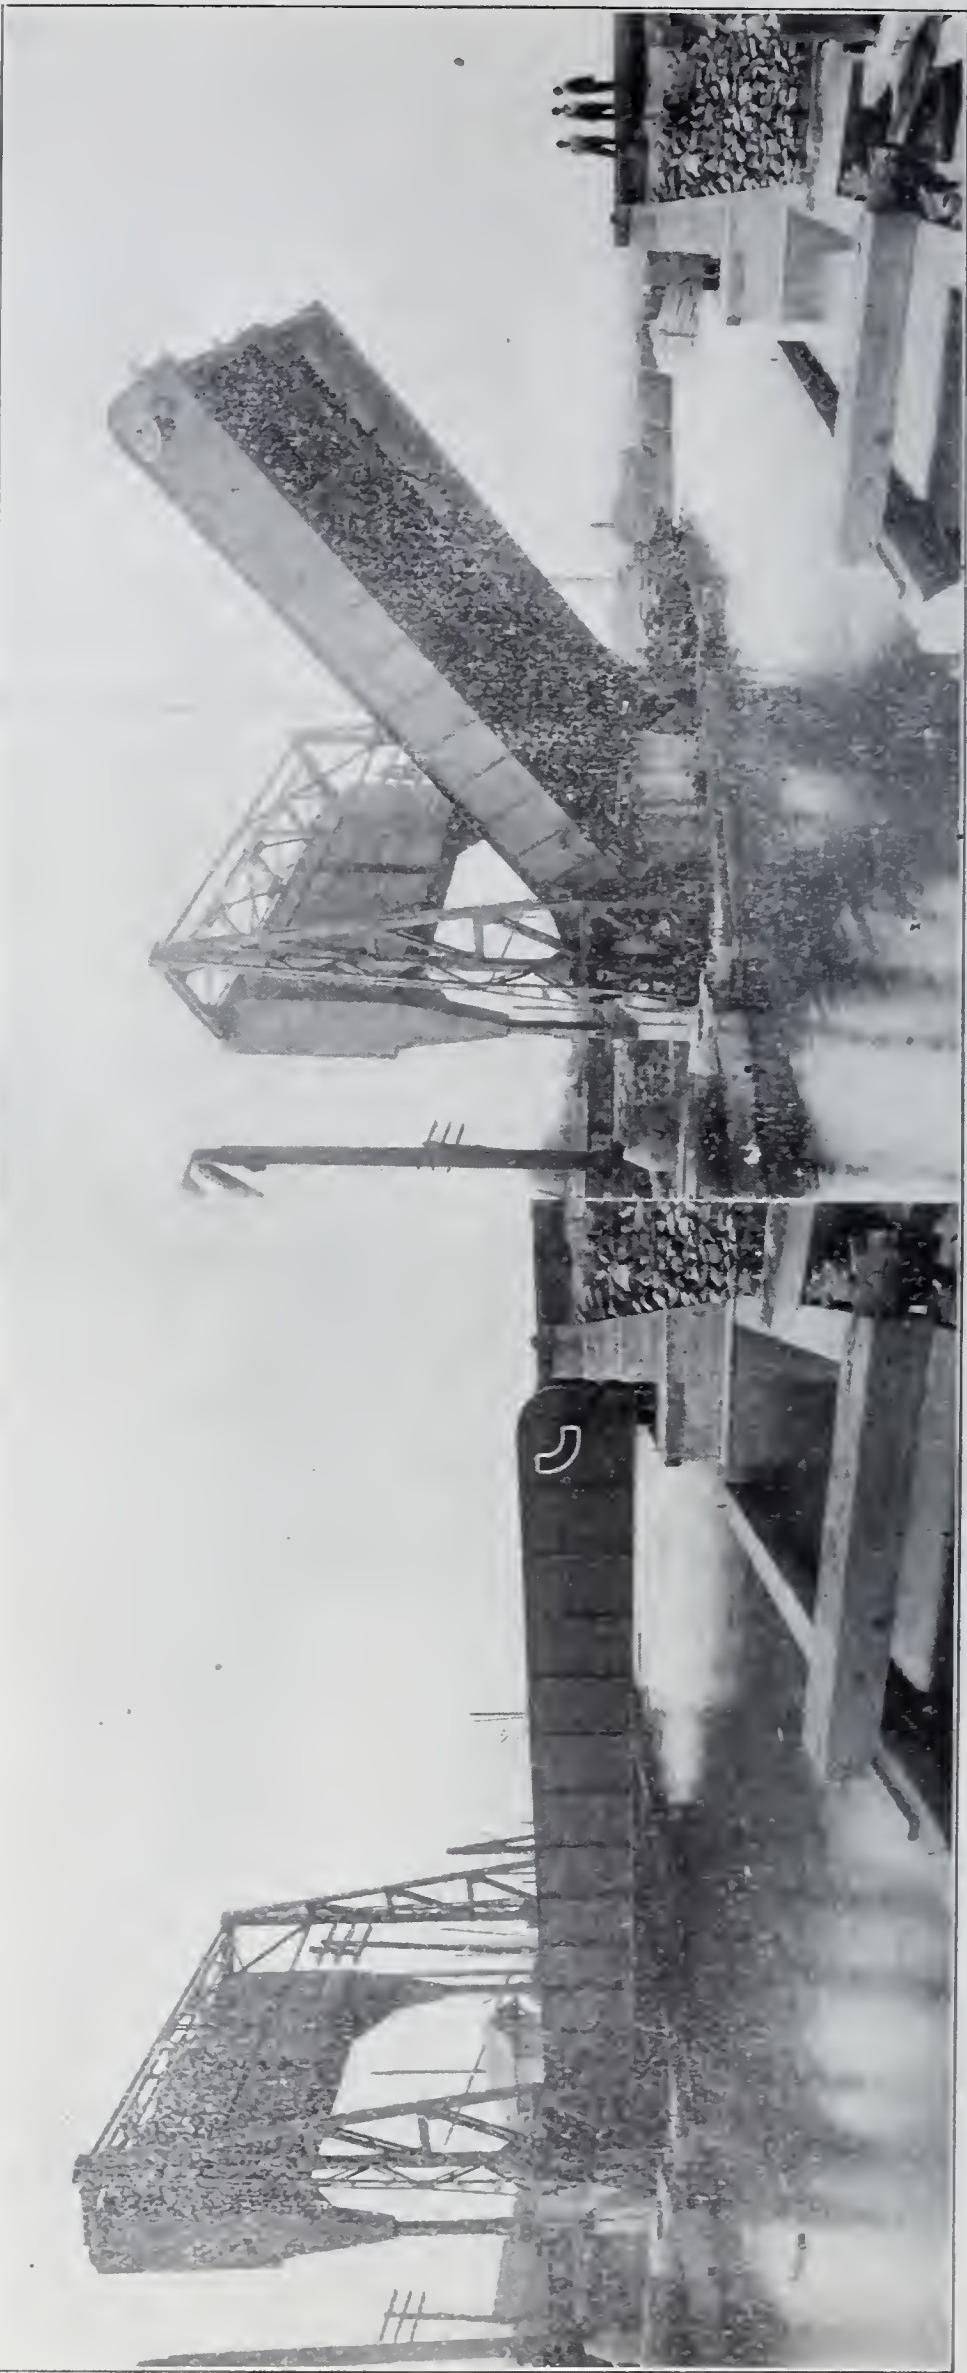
A Strauss Bascule Type with Pivoted Counterweight. Baltimore & Ohio Railroad Bridge at Staten Island, New York.
